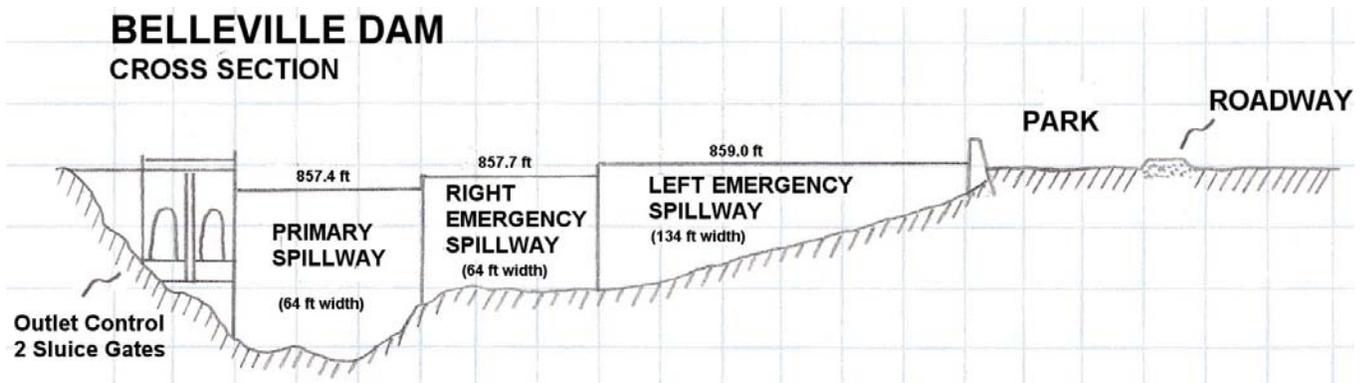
Schematic drawing of Belleville Dam, Belleville, Wisconsin.
